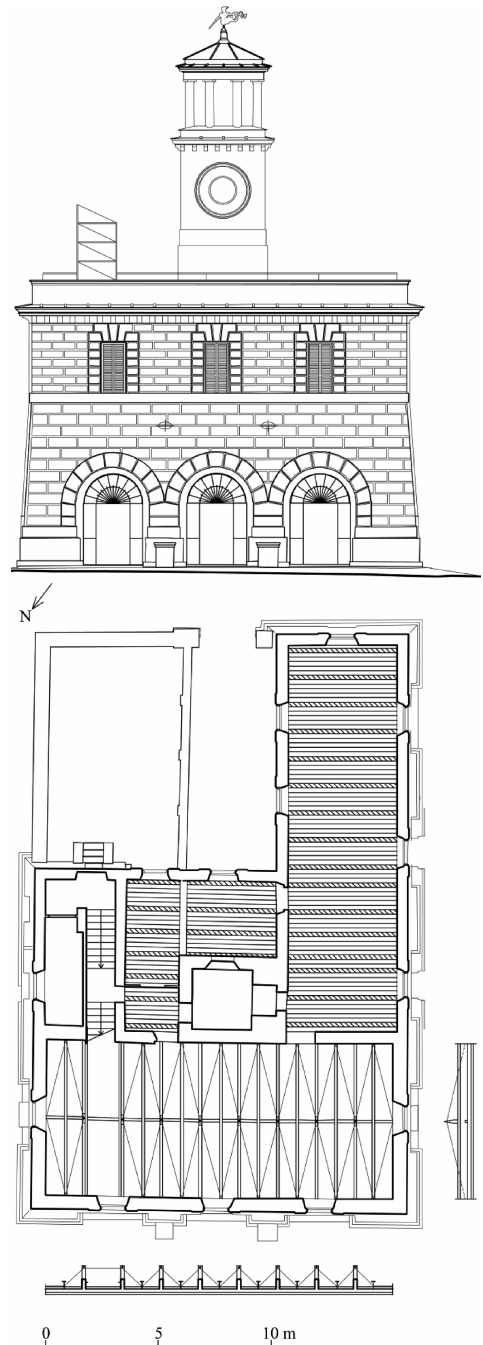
Plan of the first floor with projection of the roof structure (both existing and added) and north-west façade. Strengthened reinforced clay beams are dashed; in the bottom and right-lateral small sections is presented the three-dimensional bow-string retrofitting of the ribbed reinforced concrete roof.
